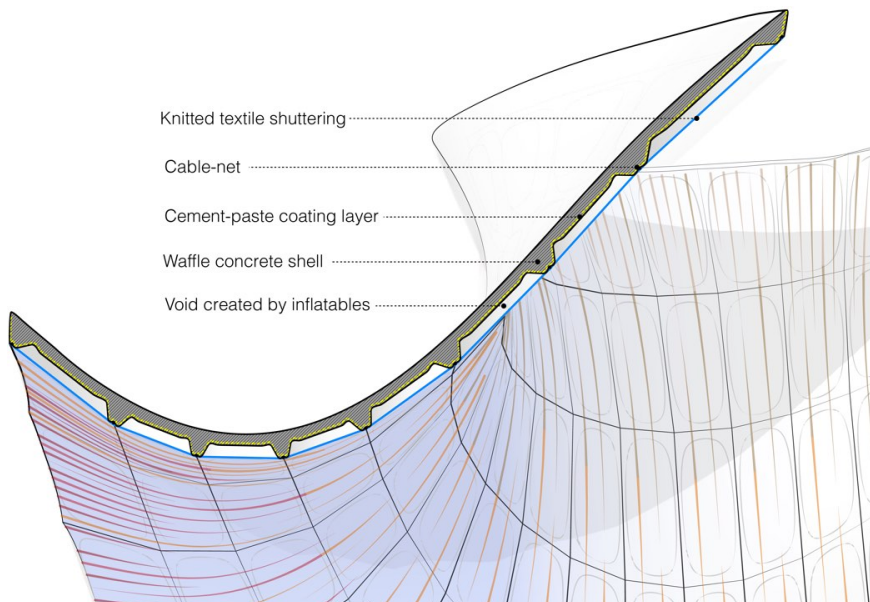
Detail section through the pavilion showing the final, concrete waffle-shell geometry.
